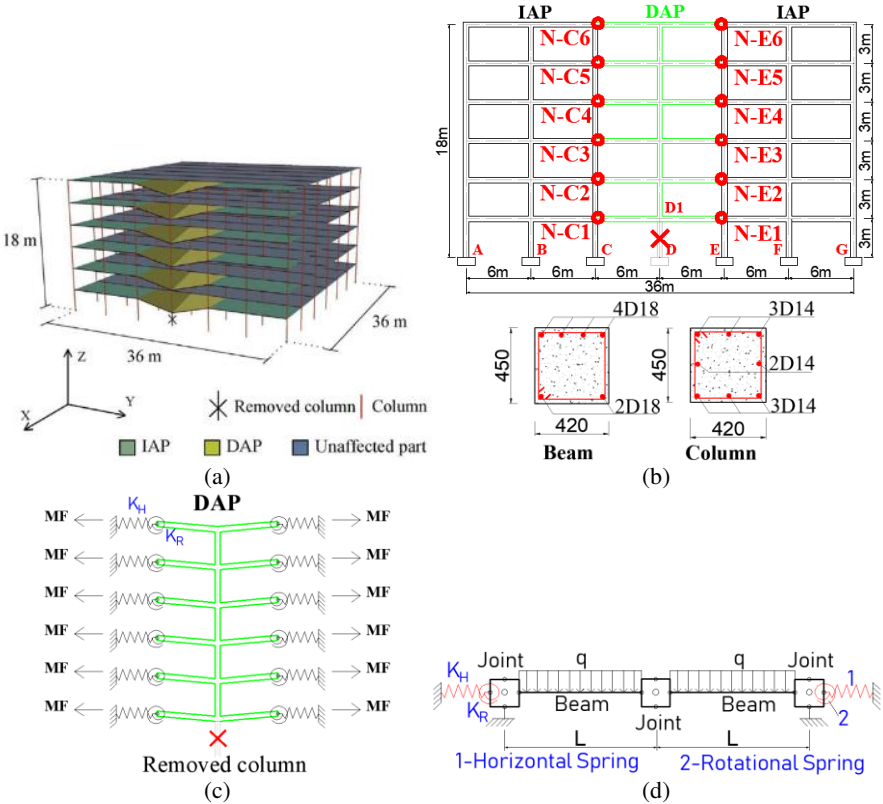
(a) A RC building subjected to an edge column removal scenario (Droogné *et al.*, 2018); (b) layout of the edge frame (designated as 'F6B6' and dimensions in m) and cross-sections of beams and columns (dimensions in mm); (c) directly affected part (DAP) with equivalent boundary conditions; and (d) equivalent DAP model.
